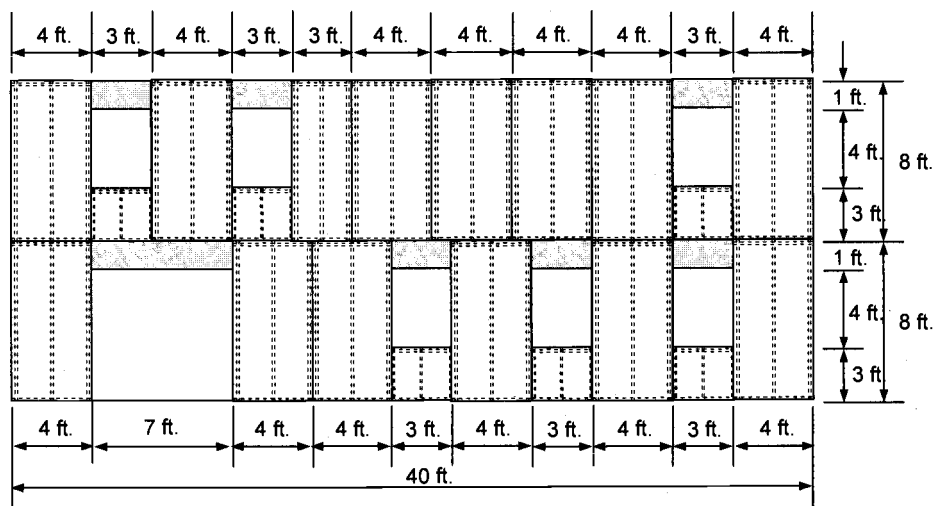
(a) – Detailed wall configurations for Type-I house model
